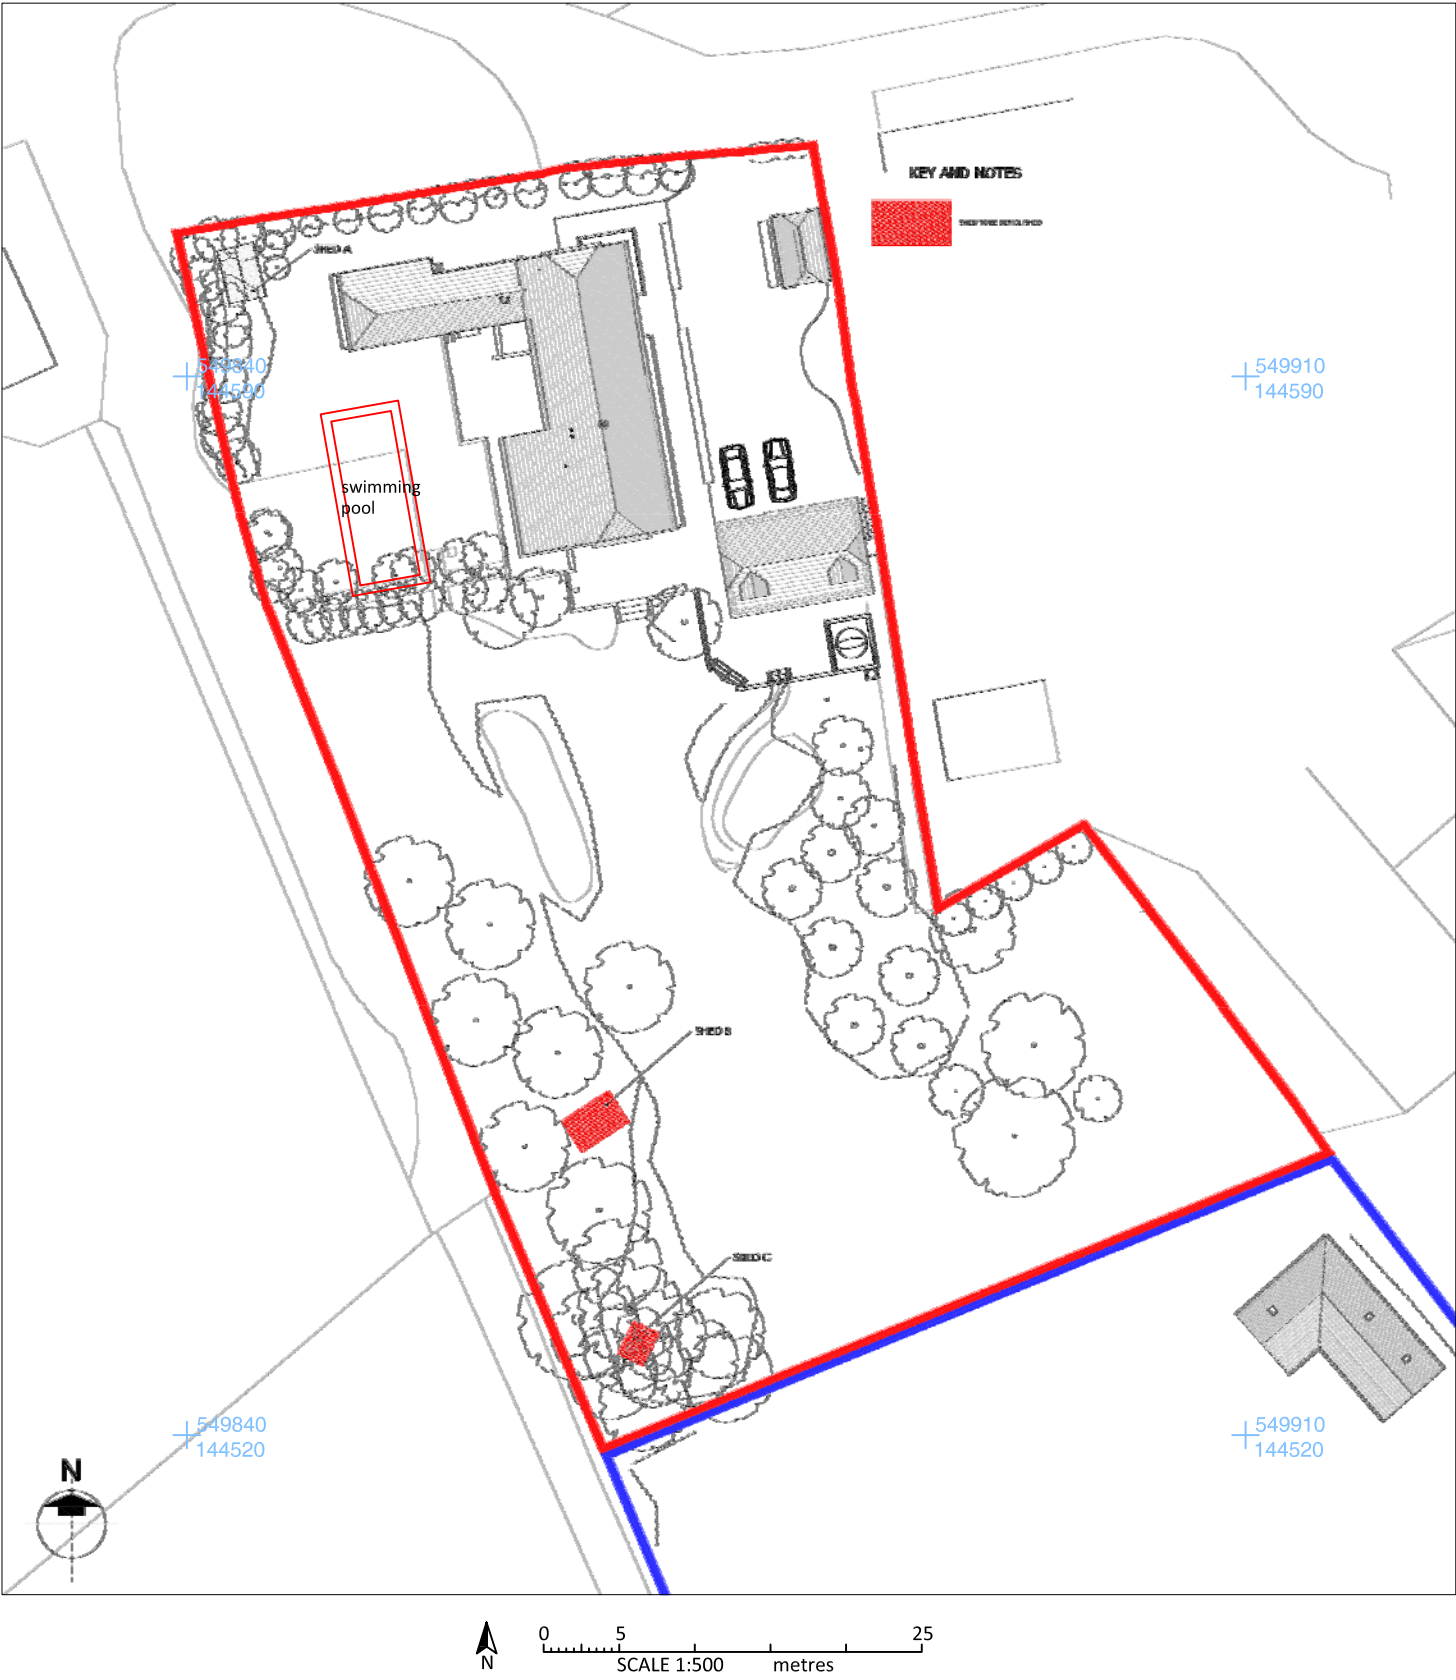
Site plan - location of the demolished sheds and proposed swimming pool.
